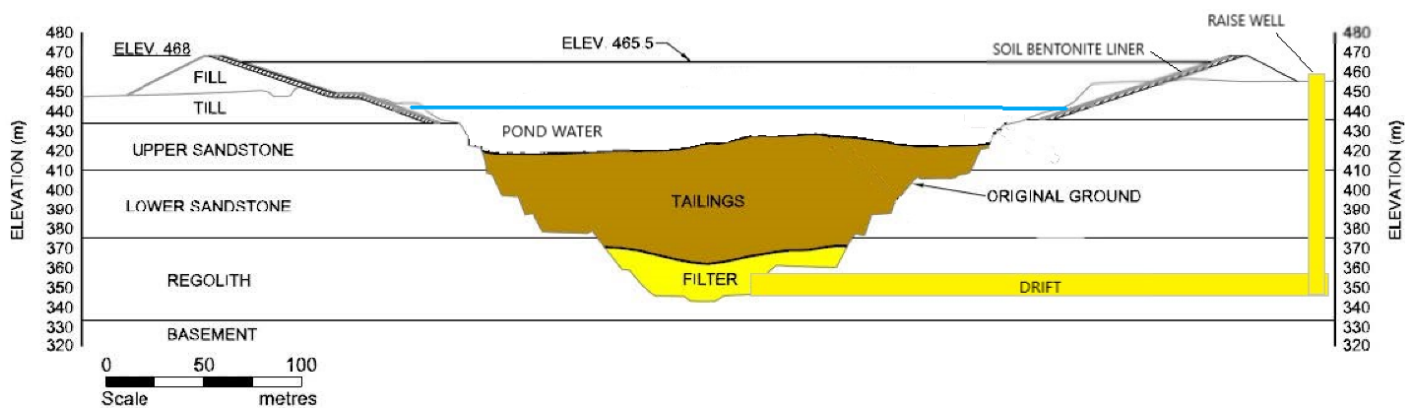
Cross section of the JEB TMF at future 468 masl elevation
